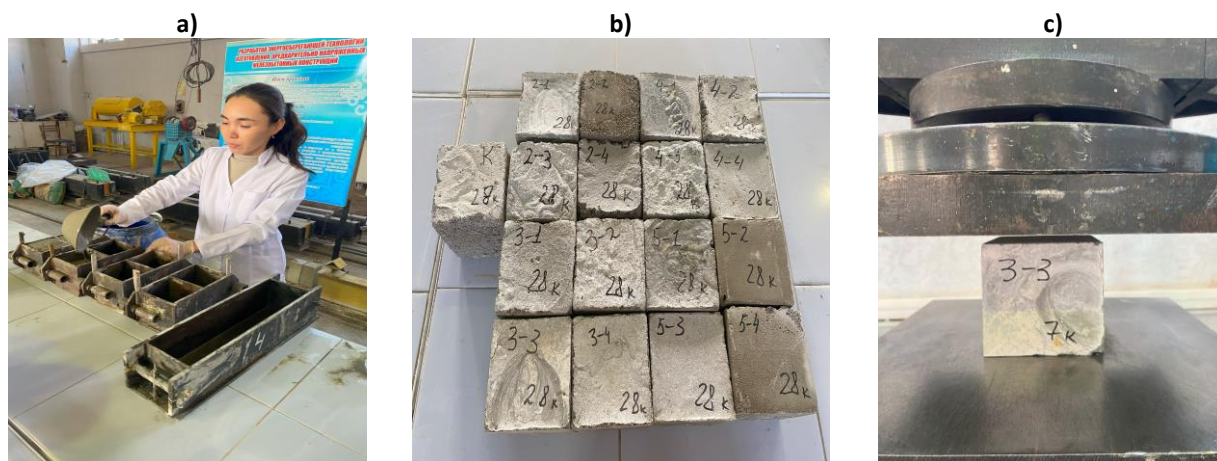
Samples of the foam concrete D600: The process of foam concrete sample preparation (a), Prepared foam concrete samples (b), Compression test of samples (c)
